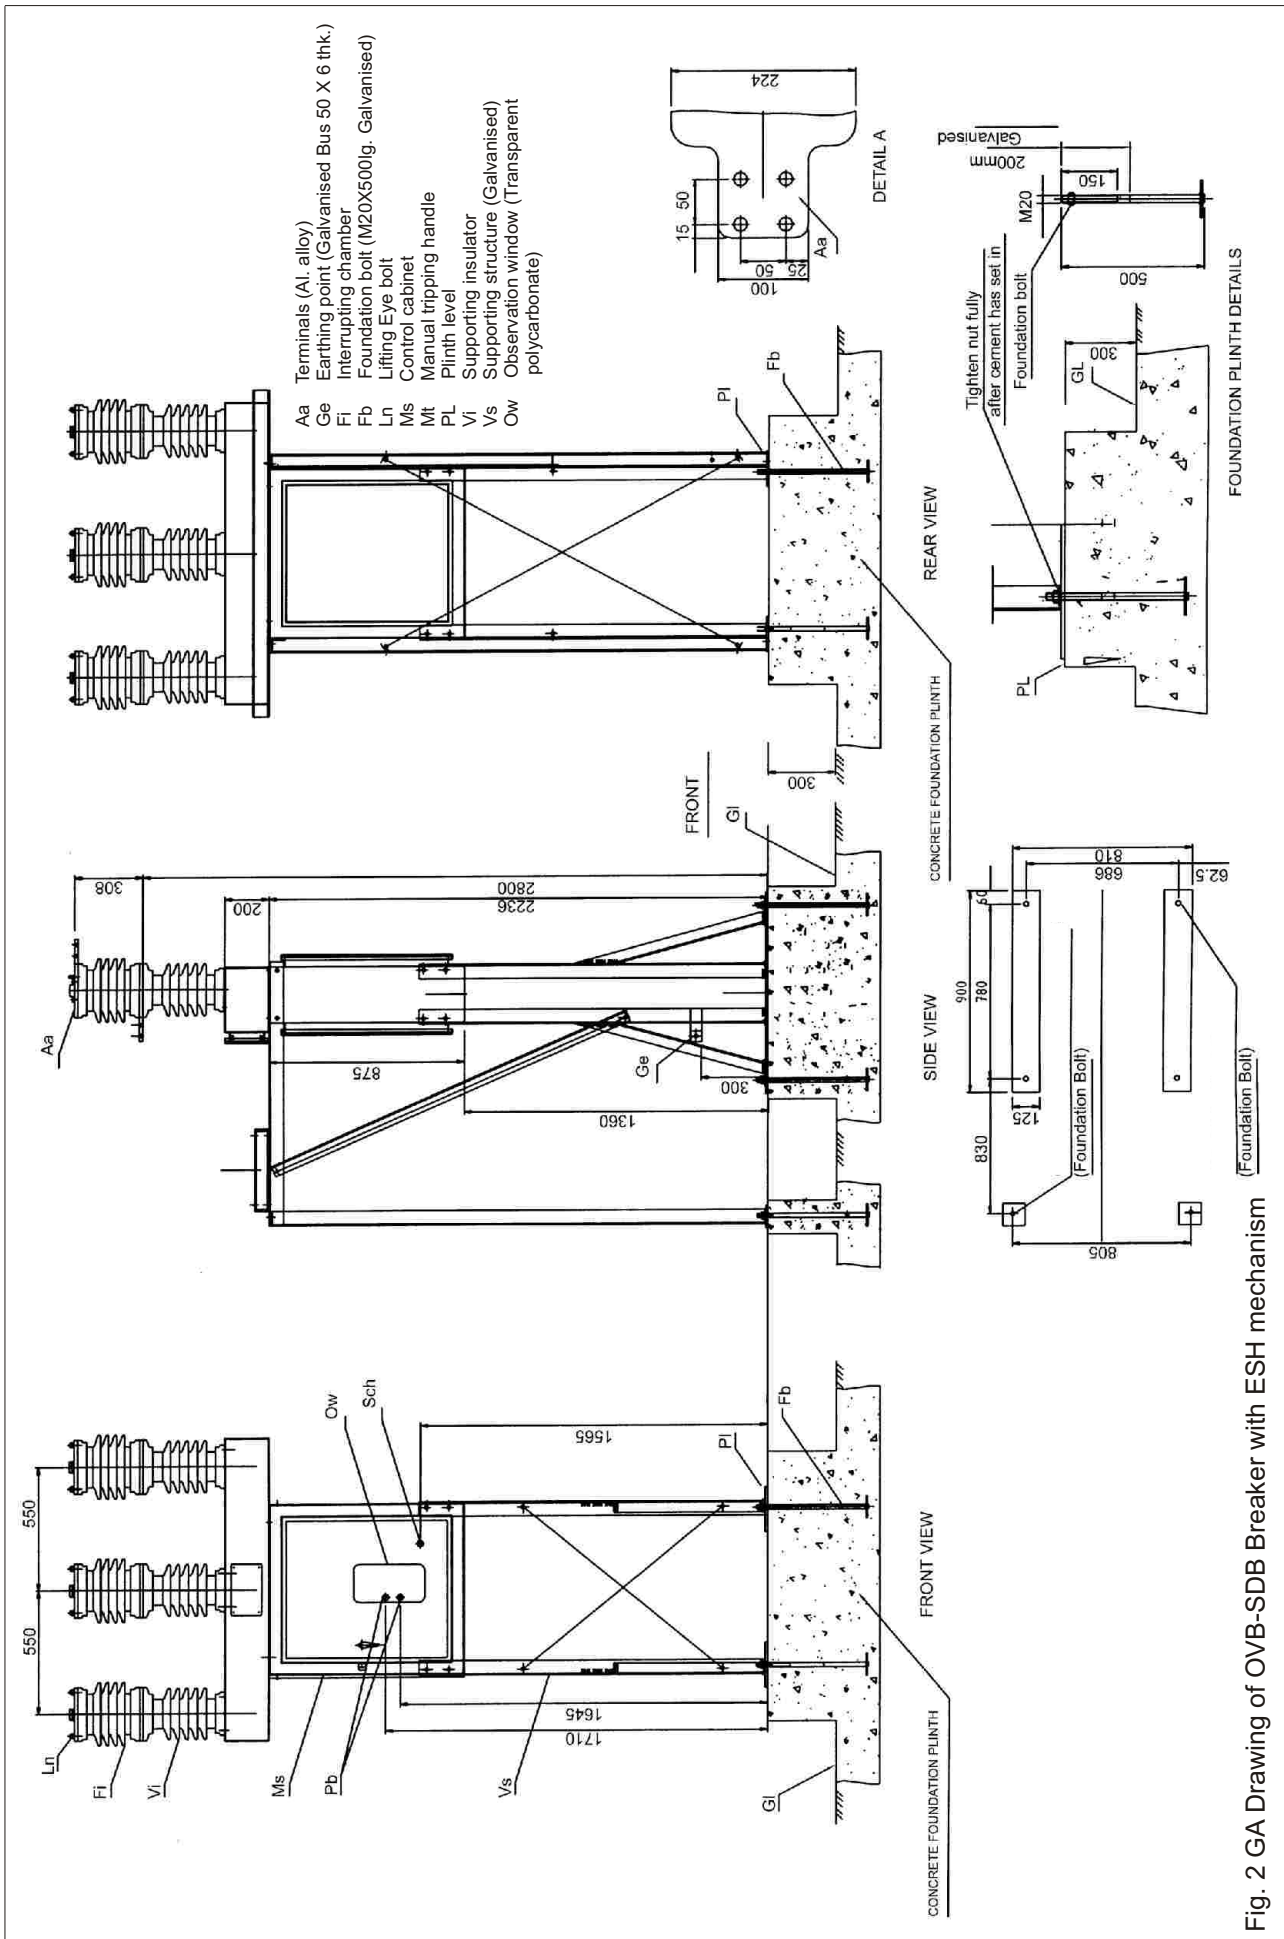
GA Drawing of OVB-SDB Breaker with ESH mechanism
